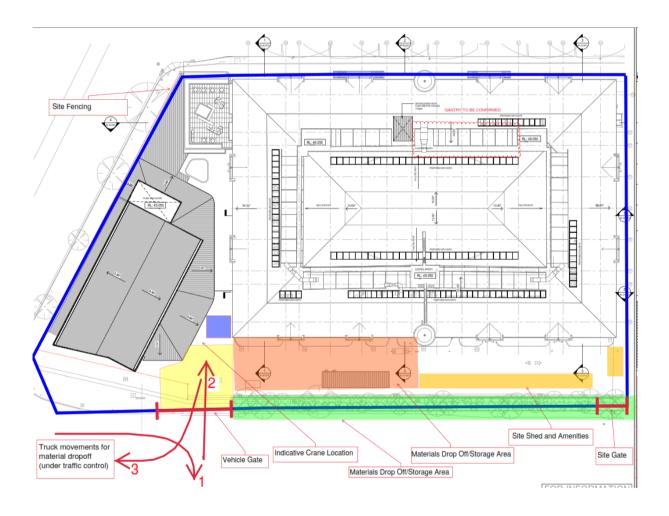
Example of Approximate Site Layout (Note: Subject to change).
